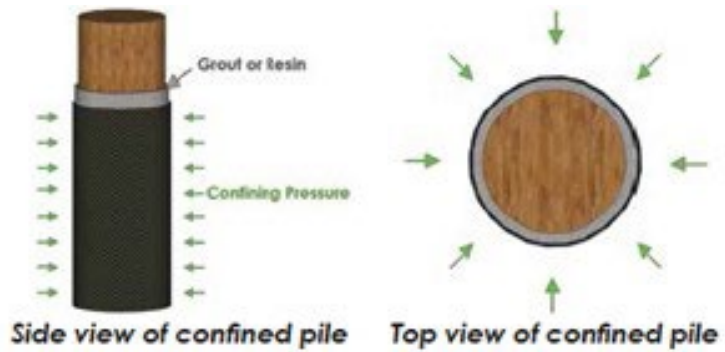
Laminate being cut to size- note while white is shown, grey would be used at Wallaga Lakes Bridge. Figure 8b: Side and top views of works once completed.
